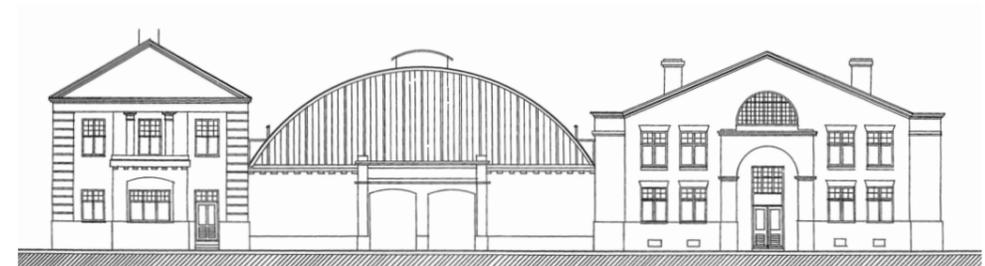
Building permit drawing from 1898. (Wallenstam, 2017. Retrieved with permission.)
